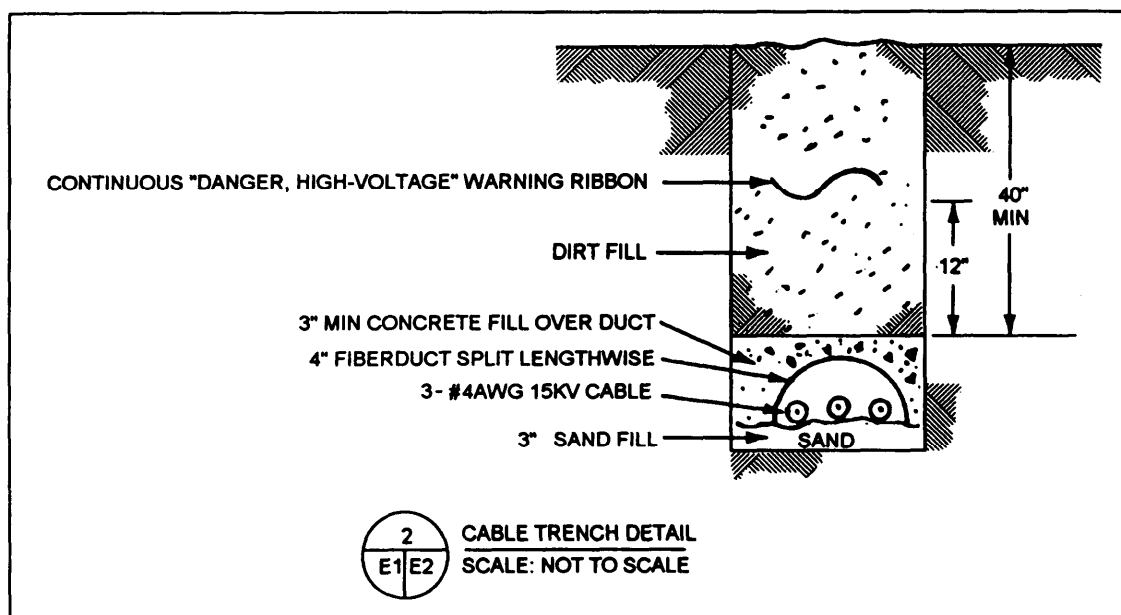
Cable-trench detail for use with the site plan shown in Figure 2-15.
